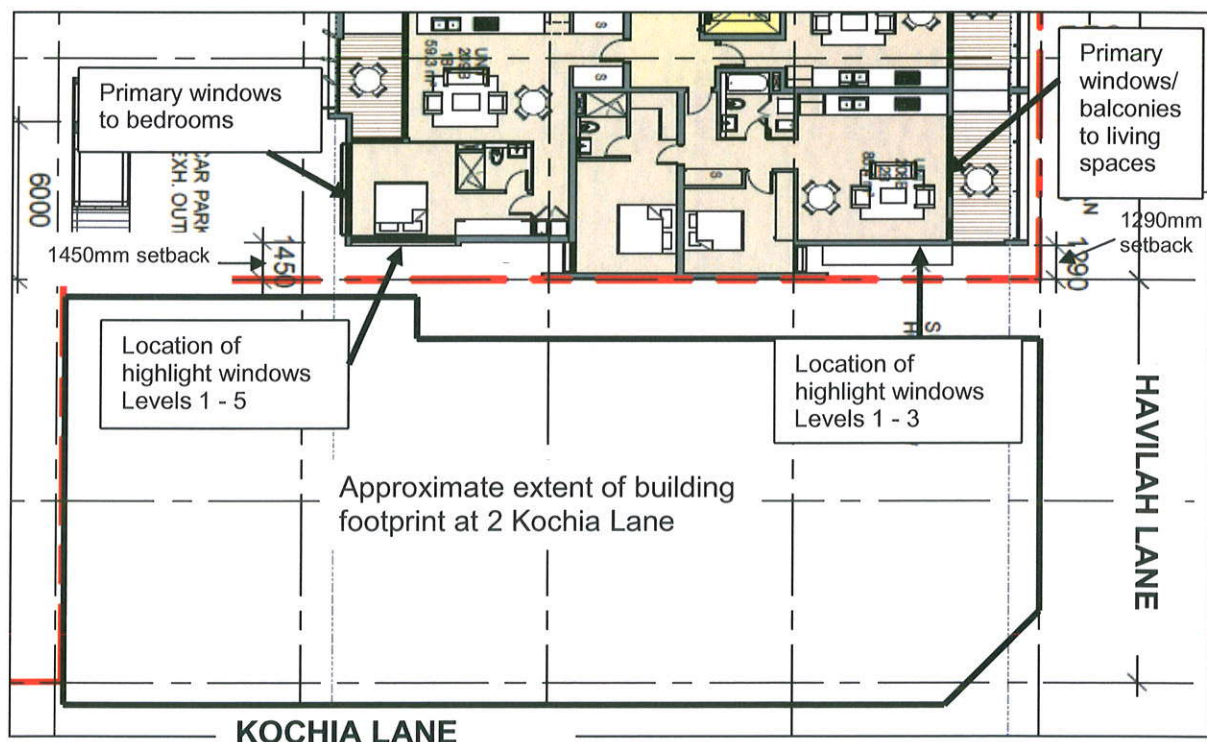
Typical floor plan detail of southern end of Eastern Tower relative to 2 Kochia Lane (Source: Proponent's amended plans)
